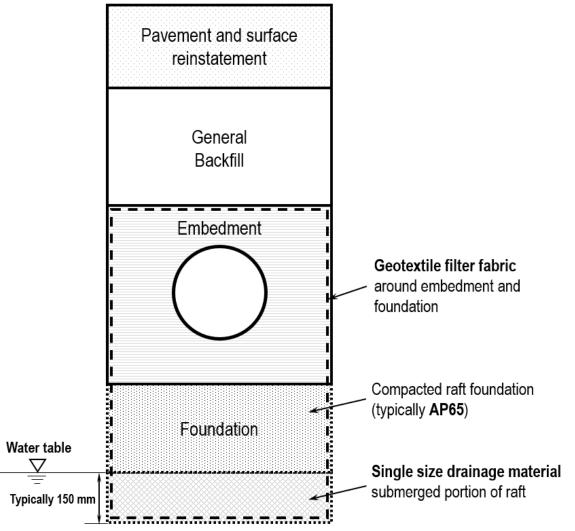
Typical trench arrangement with a raft foundation constructed of imported fill
